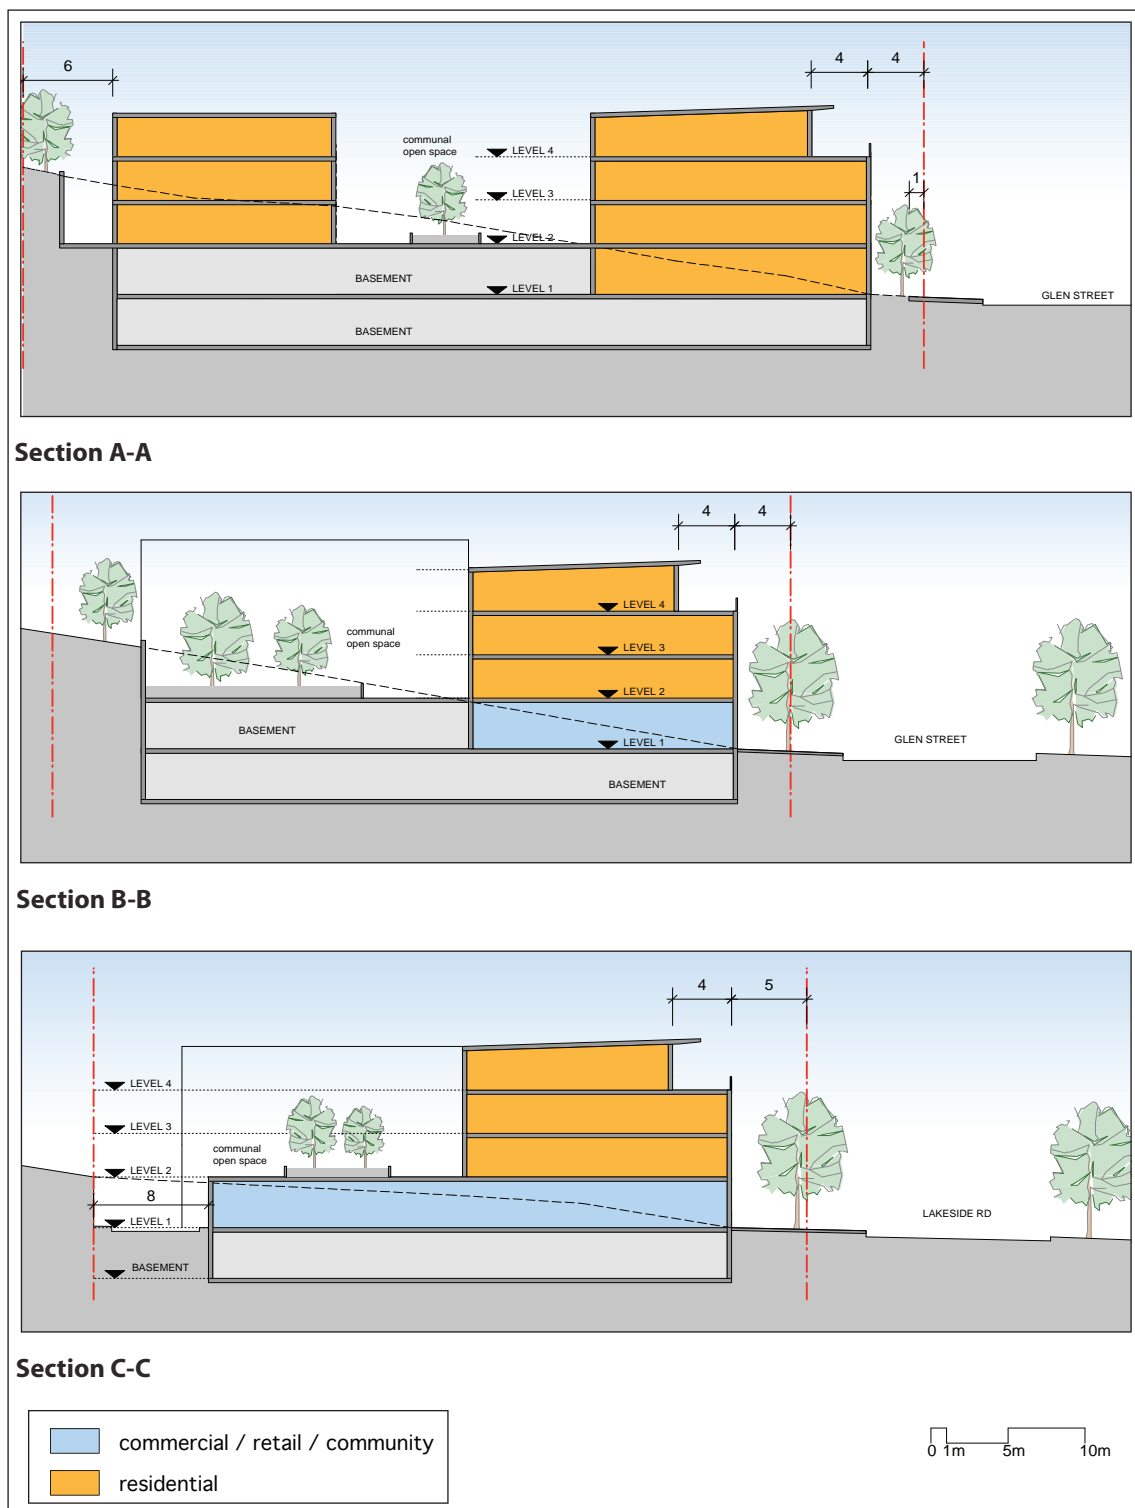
Glen Street and Lakeside Road Building Setback Controls Sections
